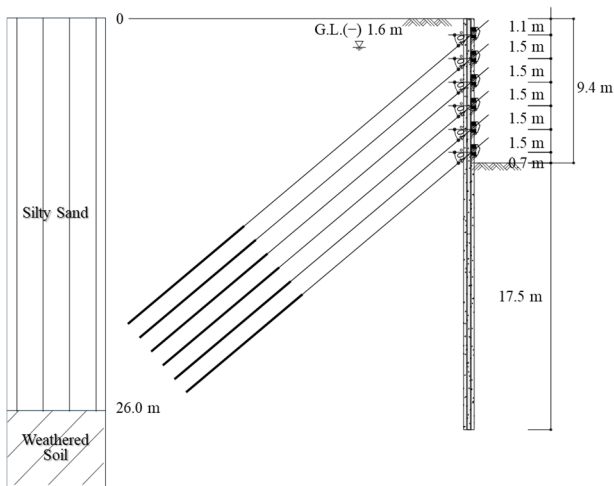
Cross section of temporary earth retaining wall and soil profiles at Songdo site.
